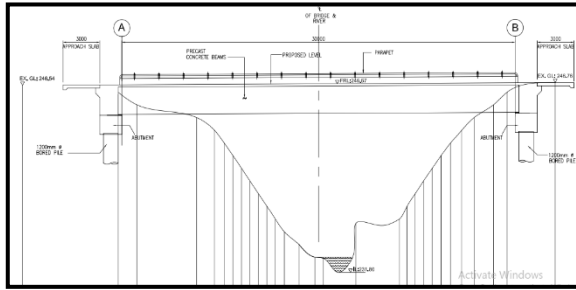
Longitudinal section of the simply supported bridge, crossing river channel
